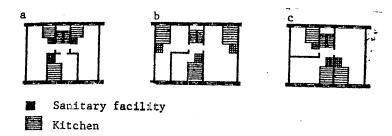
Location of kitchens and sanitary facilities in three-apartment sections. a--With entrance to the apartment on the stairwell walls; b--with entrance to the apartment and in depth on the walls separating the sections; c--adjacent on inside wall and stairwell walls.
